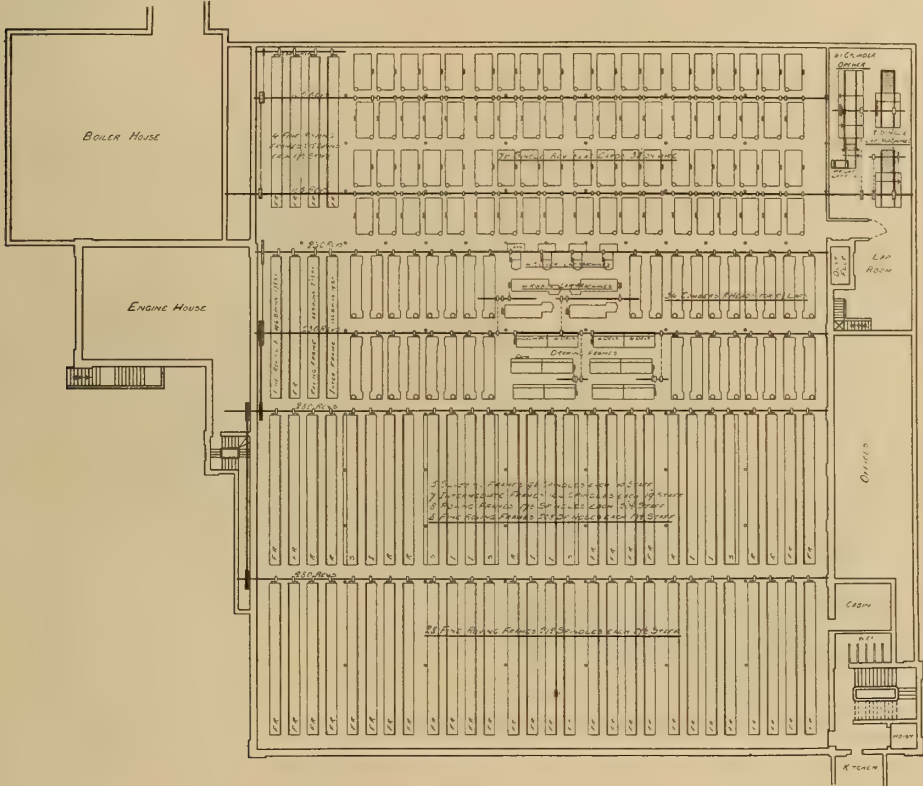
CAIRO MILL, OLDHAM. MACHINERY BY ASA LEES & CO., LTD.
